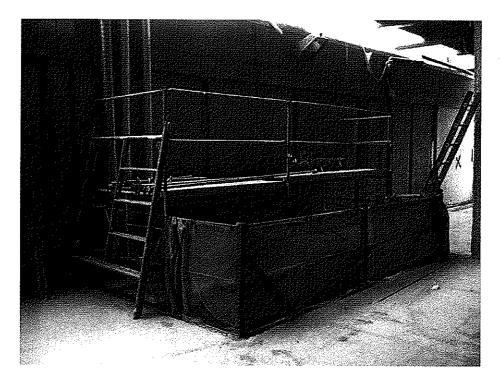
SCAFFOLDING OVER OPENING IN FLOOR EAST WALL (NORTH SECTION)
